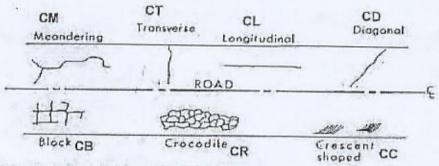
CRACKING OF FLEXIBLE PAVEMENTS
